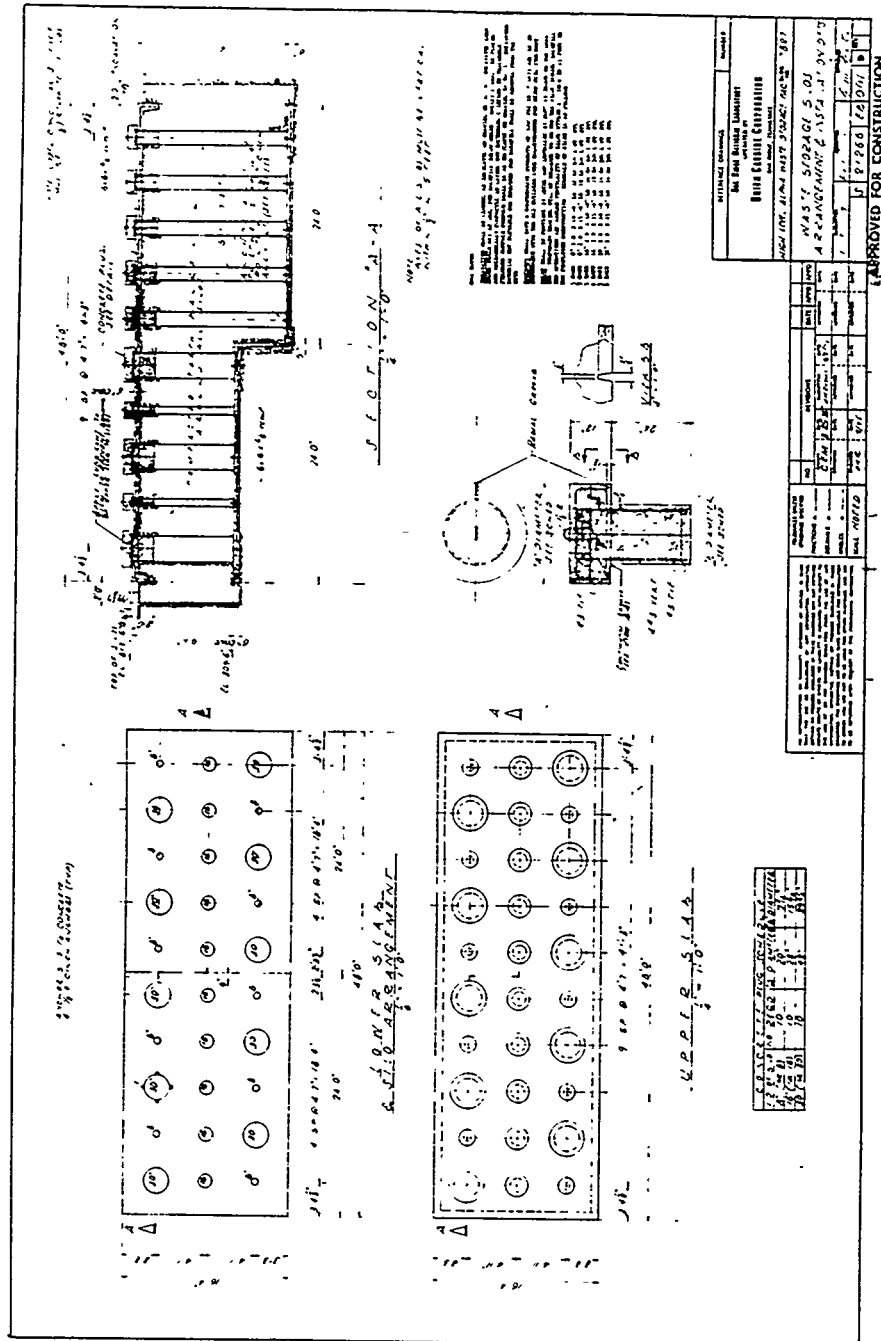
TRENCH WITH CONCRETE CASKS CONTAINING BETA-GAMA TRU WASTE
